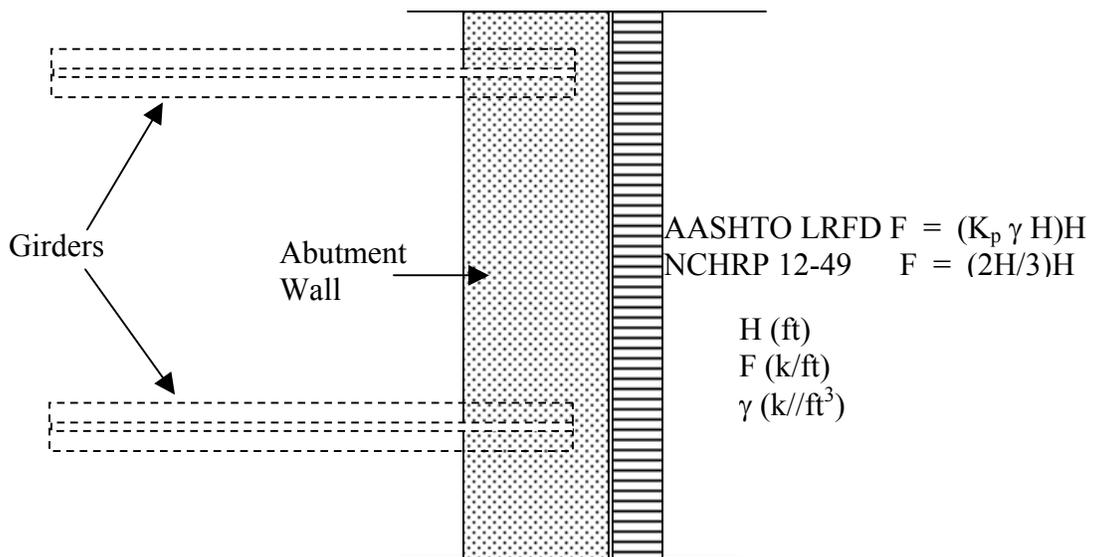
Horizontal bending in the abutment wall between beams due seismic loads.
